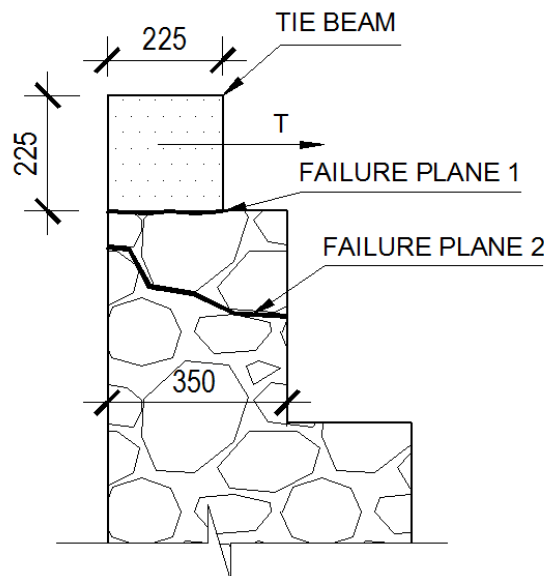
Possible Shear Failure Planes of RRM for Case 3
